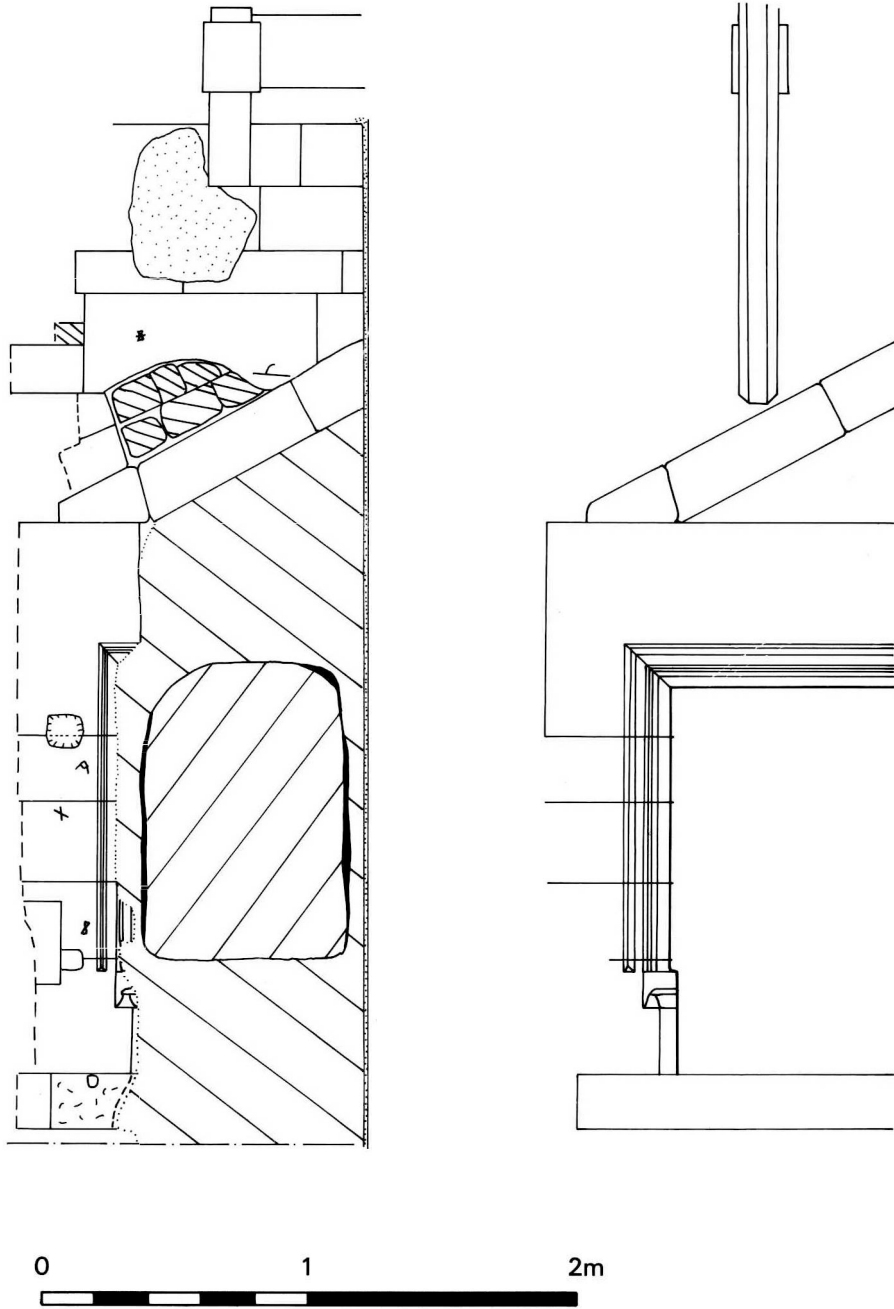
Part of fireplace, as it survives and as reconstructed.
